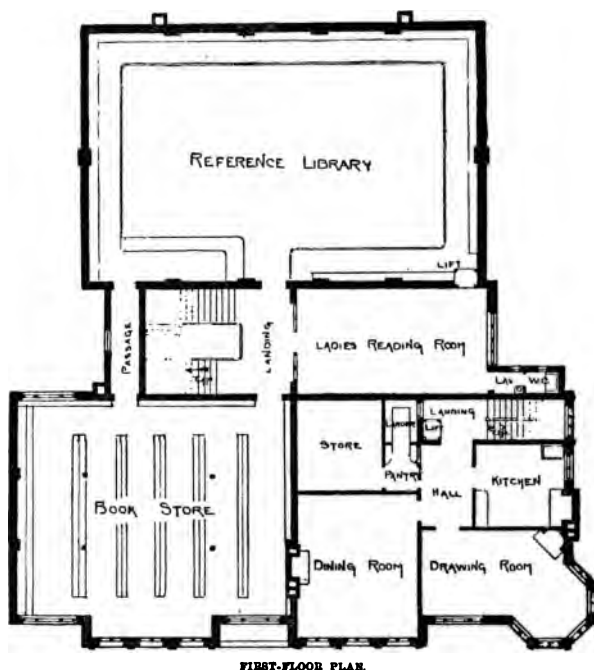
Plan of the first floor of the Battersea Public Library.
